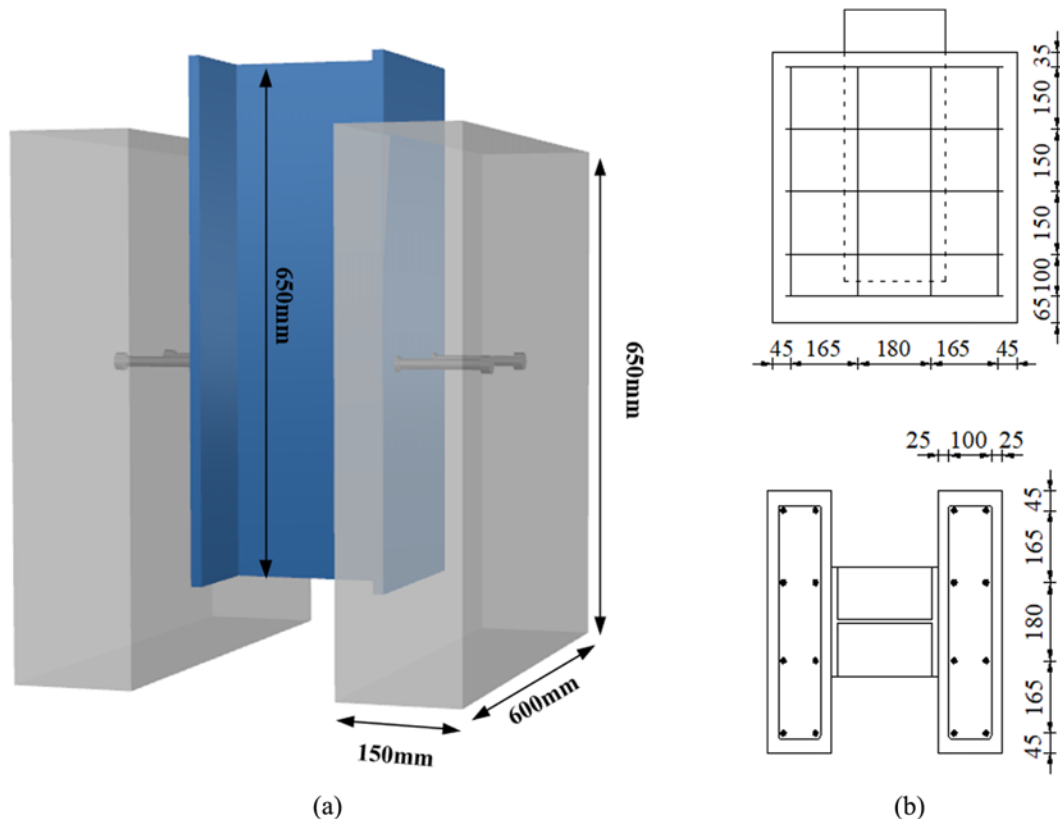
Standard Specimen for the Stud Push-Out Test: (a) Three Dimensional Views of Specimen, (b) Details of Specimen (unit: mm)
